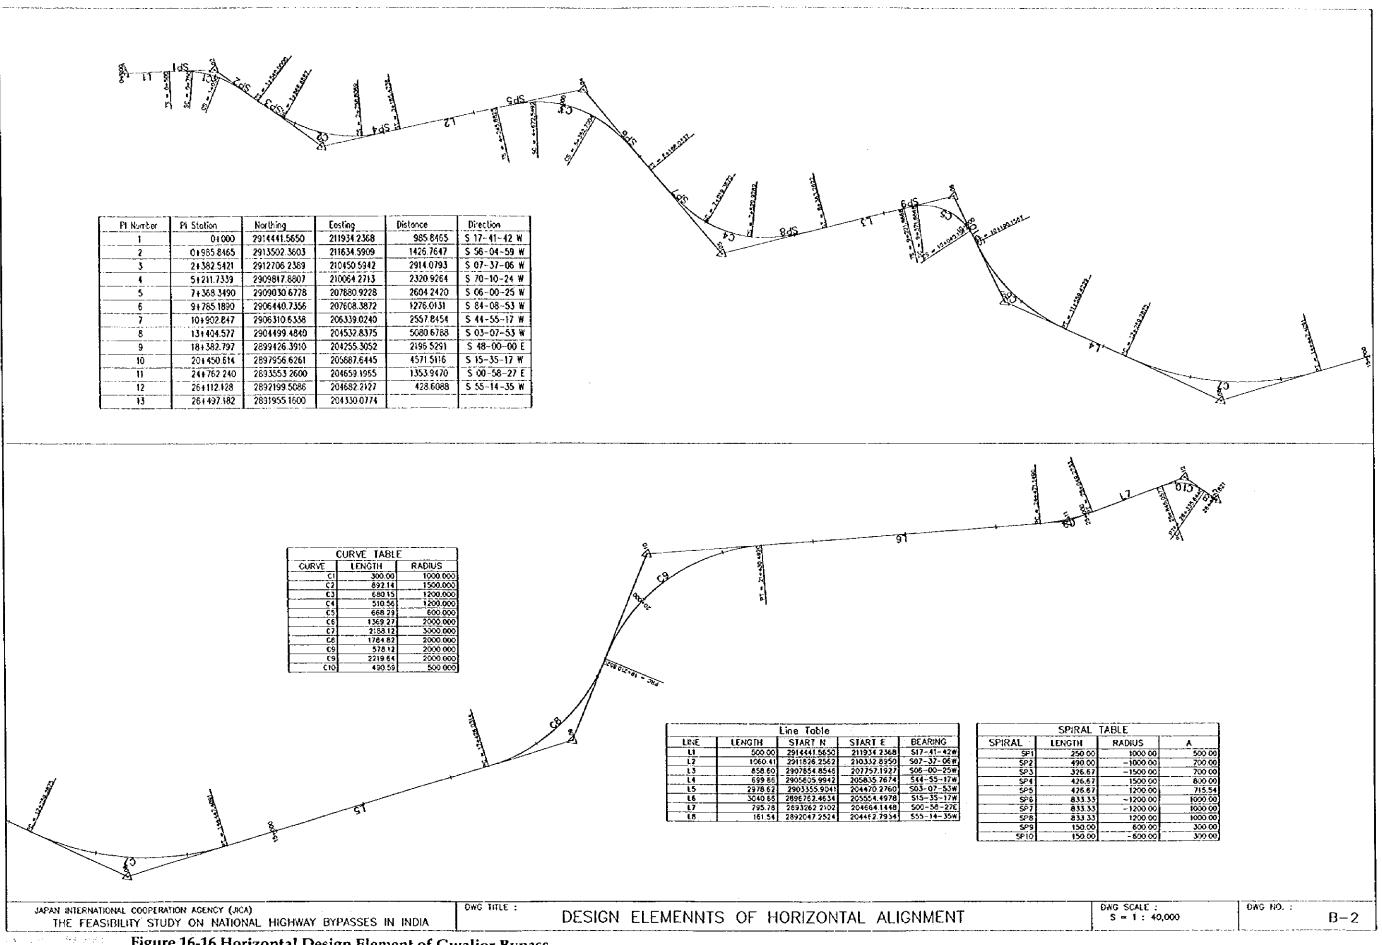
Horizontal Design Element of Gwalior Bypass
